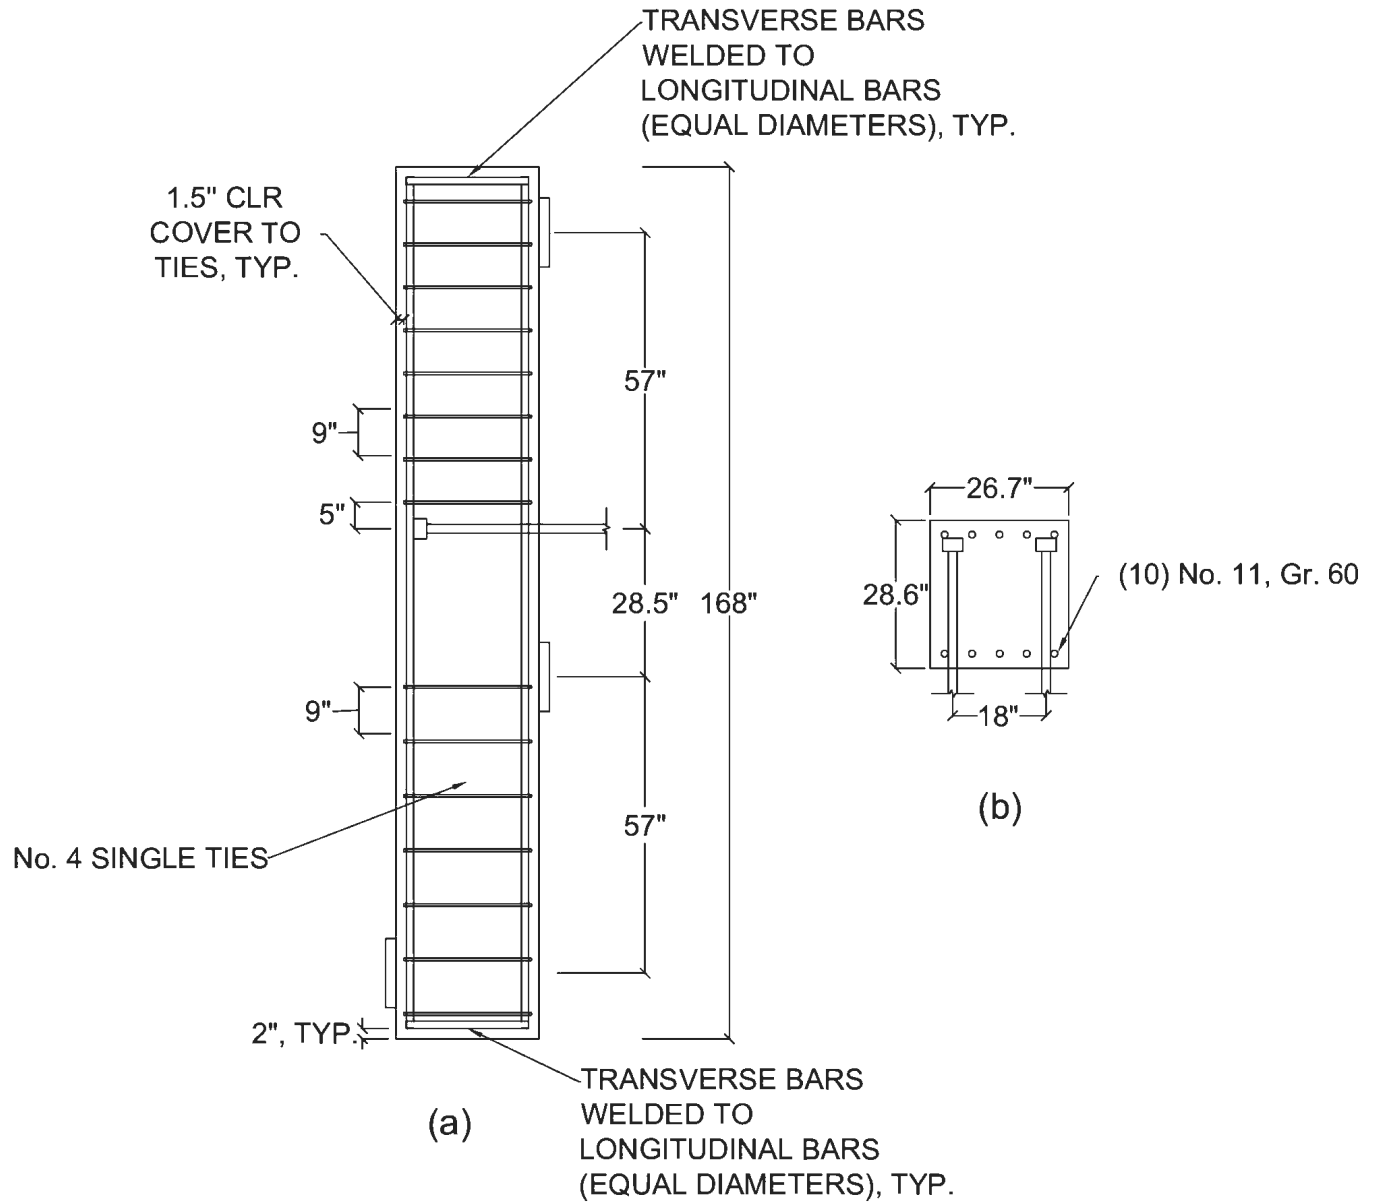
Details of reinforcement layout for No. 14 headed bar specimen 14-1A: (a) elevation, (b) cross-section
